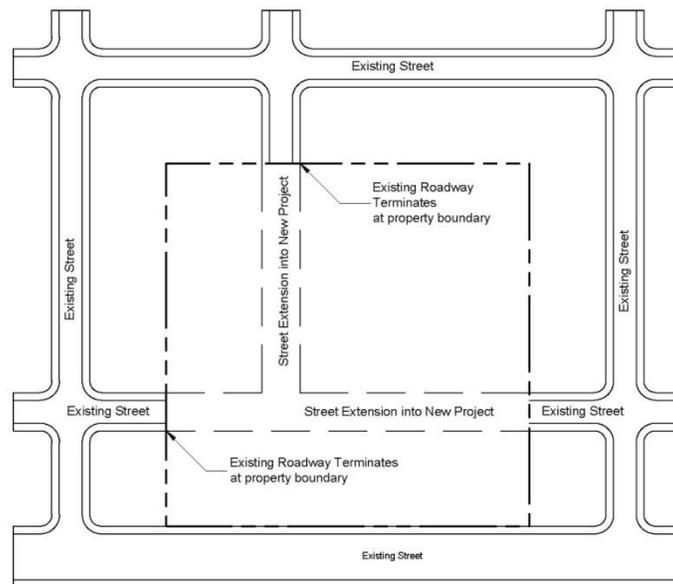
(a).1. – Site Layout – Street Extensions into New Projects/Developments
